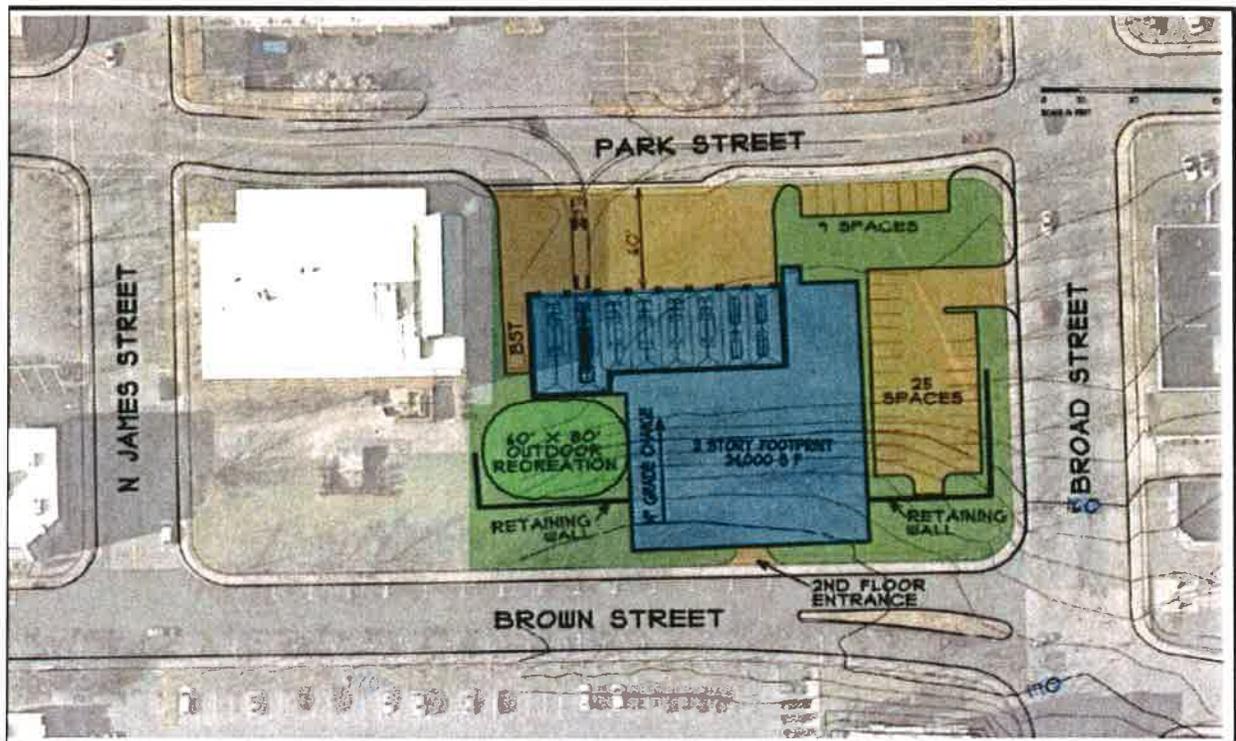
Design Study / Conceptual Site Layout, Brown Street Site
